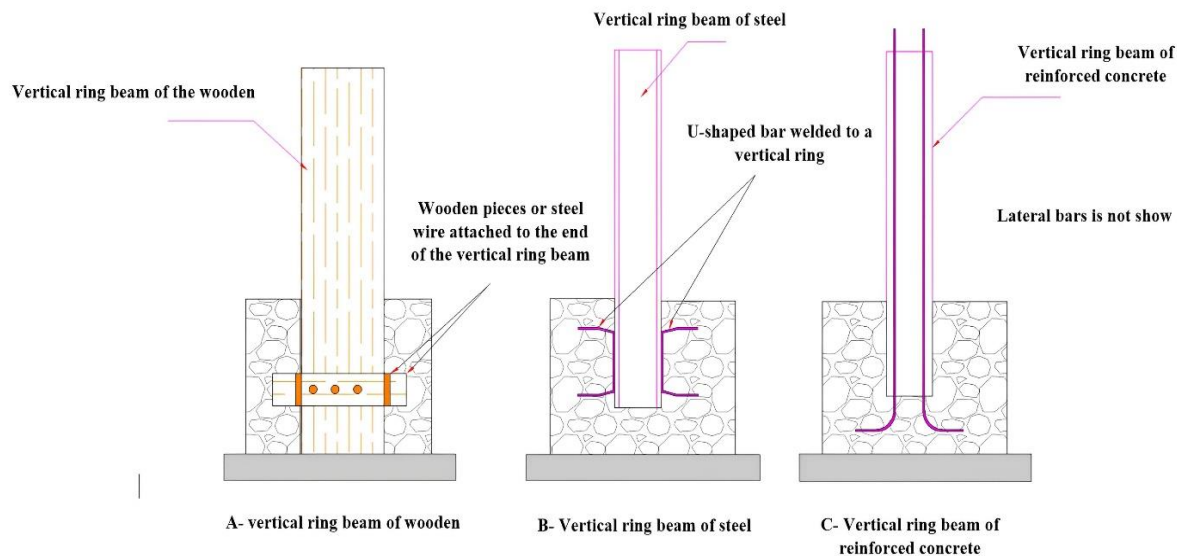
The details of vertical ring beam anchor in the foundation of masonry based on 2800 Standard
